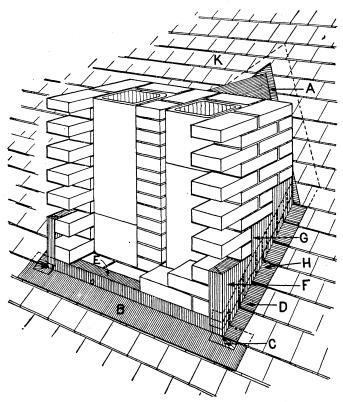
Chimney and roof connection. Sheet metal A should extend under shingles K at least 4 inches. Apron B bent as at E with base flashings C, D, and H and cap flashings F and G, lapping over the base flashings provide watertight construction. When the chimney contains two flues the joints should be separated as shown
